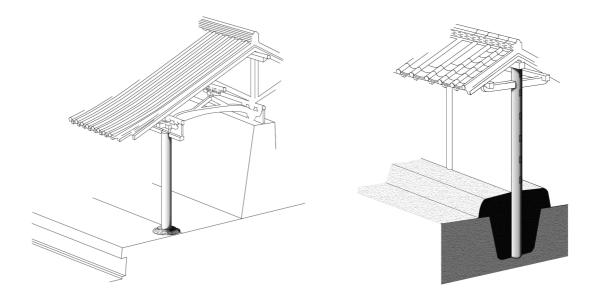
Buildings with cornerstones on which pillars are laid (left), and buildings with pillars sunk into the ground (right).
